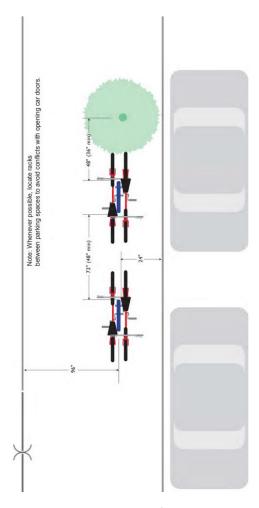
Typical Layout of Parallel Sidewalk Bike Parking Installations (Source: APBP²)
